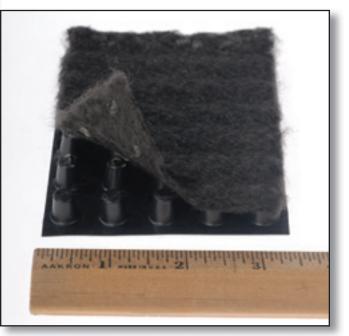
Geocomposites such as sheet drains have a large cross section that allows drainage. If geotextiles are placed under the trail tread, the sheet drain should be oriented with the geotextile on the bottom and the plastic core on top. This orientation reduces the amount of fill needed.
